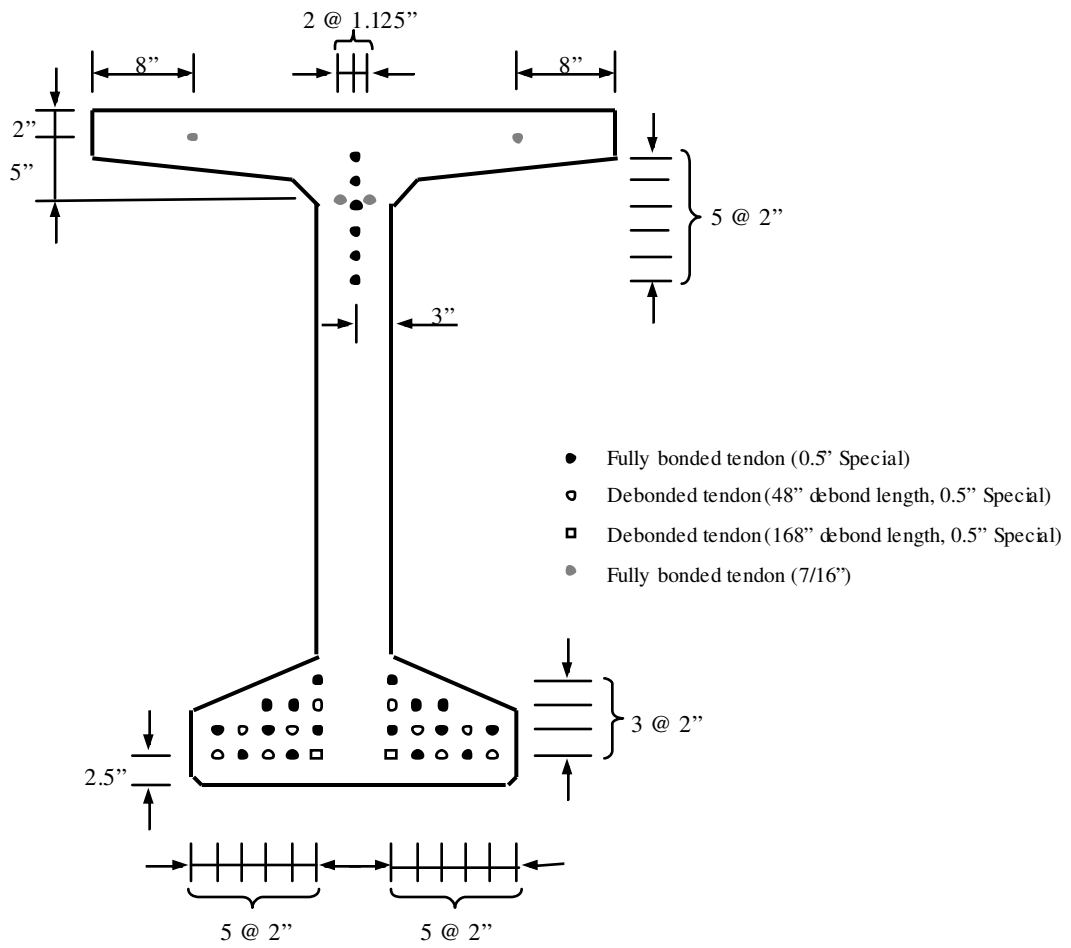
Cross-sectional Prestressing Tendon Profile at Girder End (Swenson 2003a)
